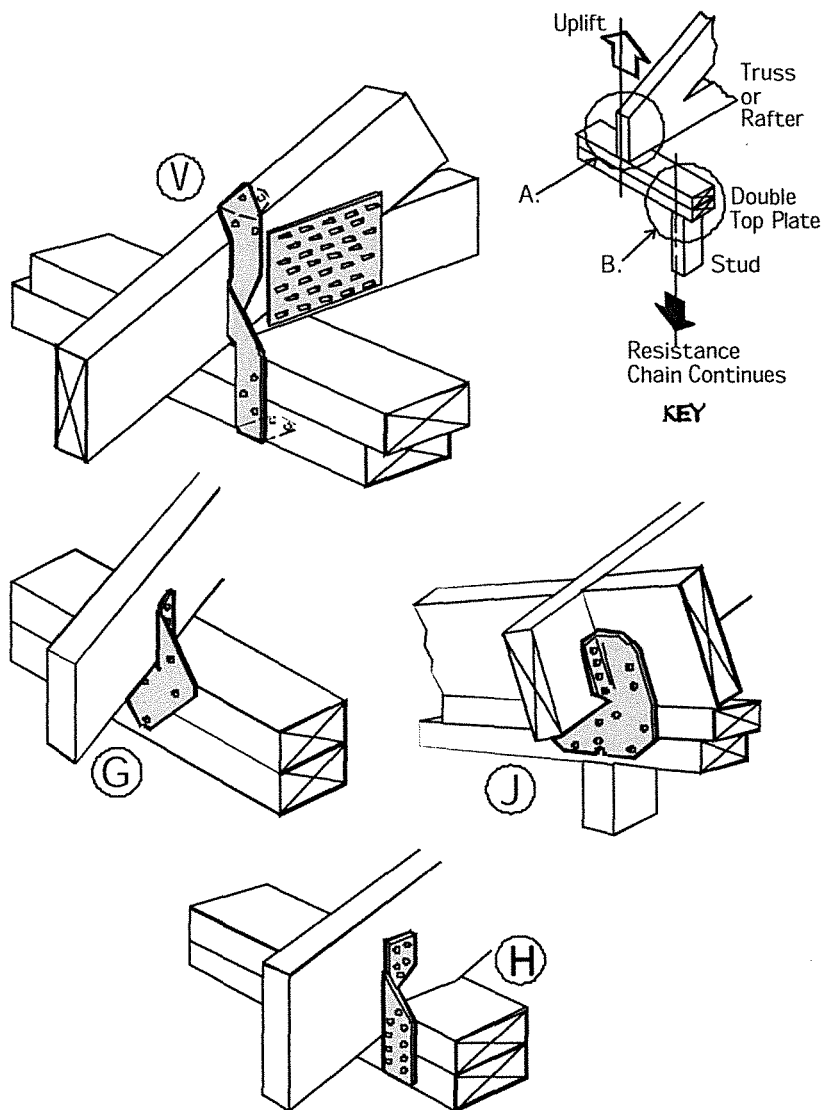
Truss/Rafter to Double Top Plate Connectors
